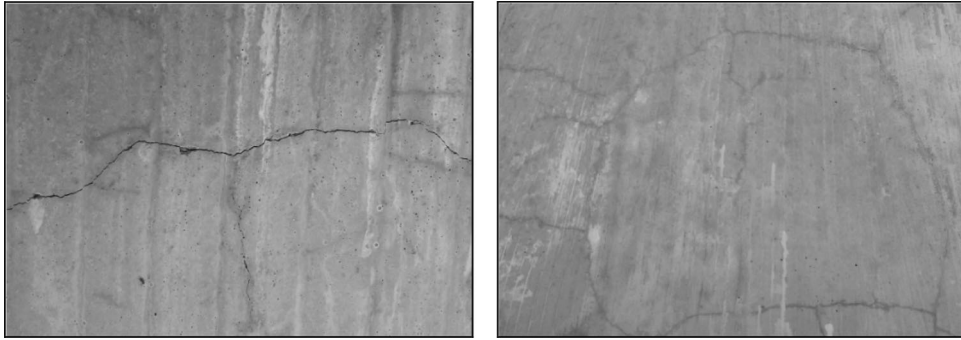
Case of crack occurrence in the LMC bridge deck pavement.
